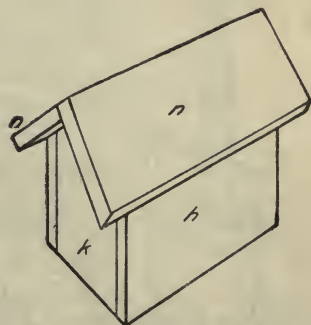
House ready to place over floor and posts as shown in figure 14.
